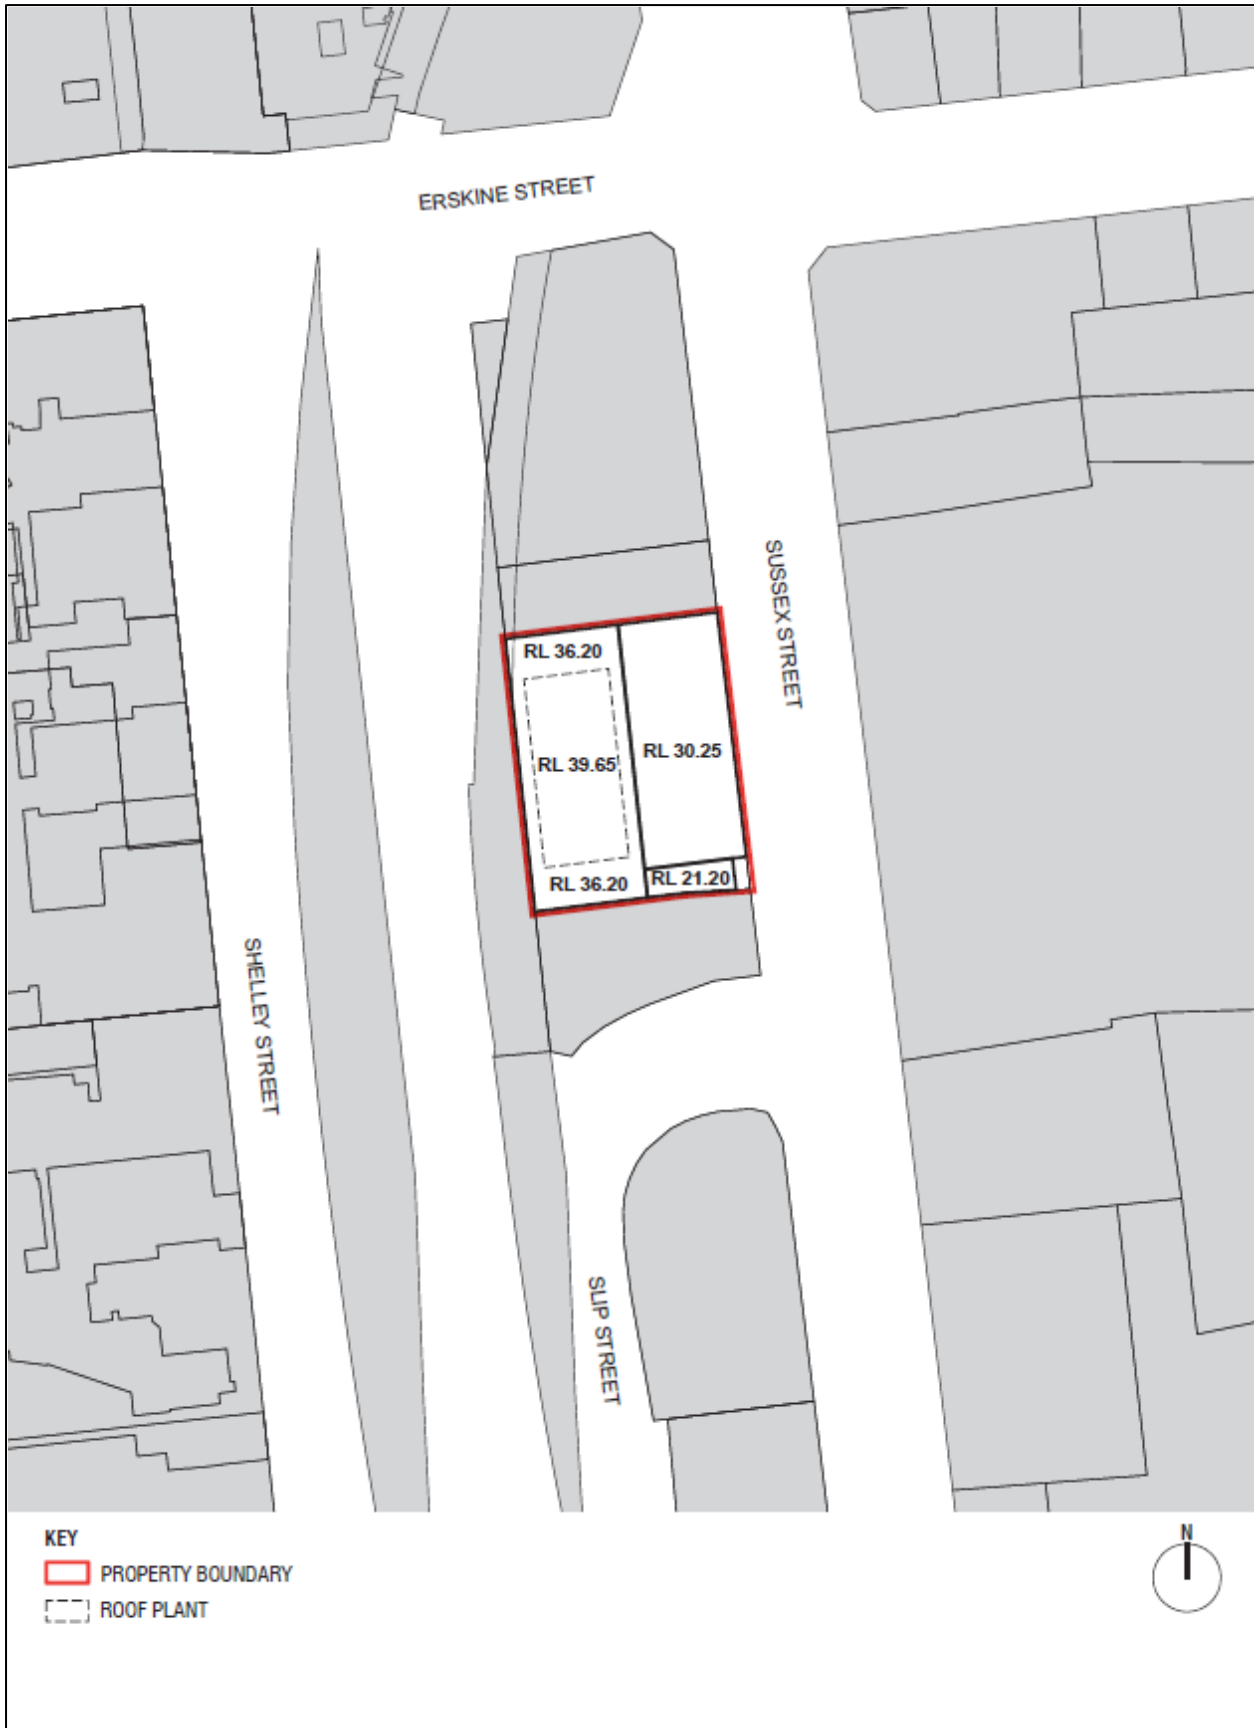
xx: 65-79 Sussex Street – Building height RLs
